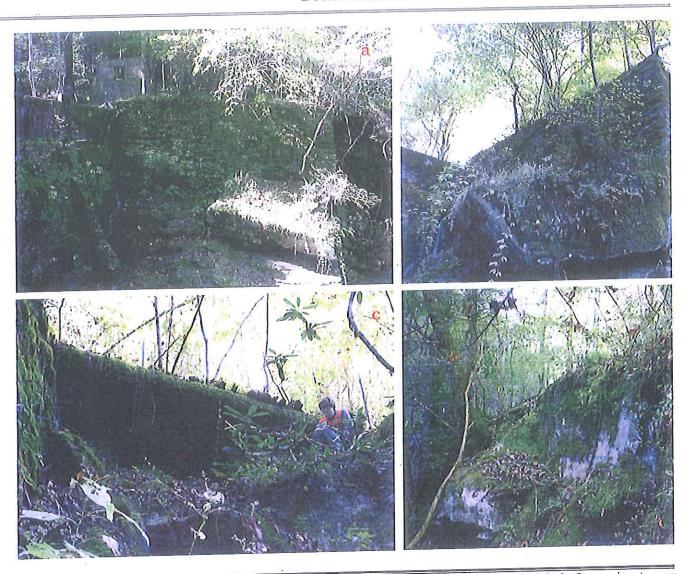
d. Overview photographs of various features at MC 207: a) stone retaining wall/artificial platform, view to nor platform; view to west; c) log platform, view to northwest; d) concrete retaining wall, view to west.
